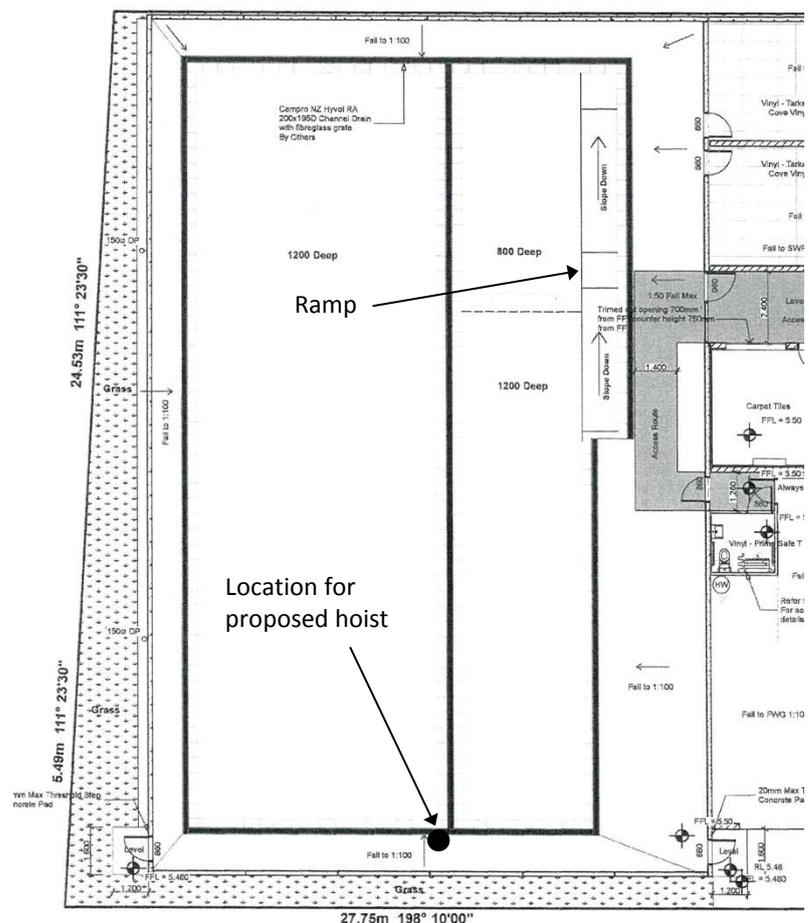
Plan showing ramp as approved, and the location of the proposed hoist (not to scale).
